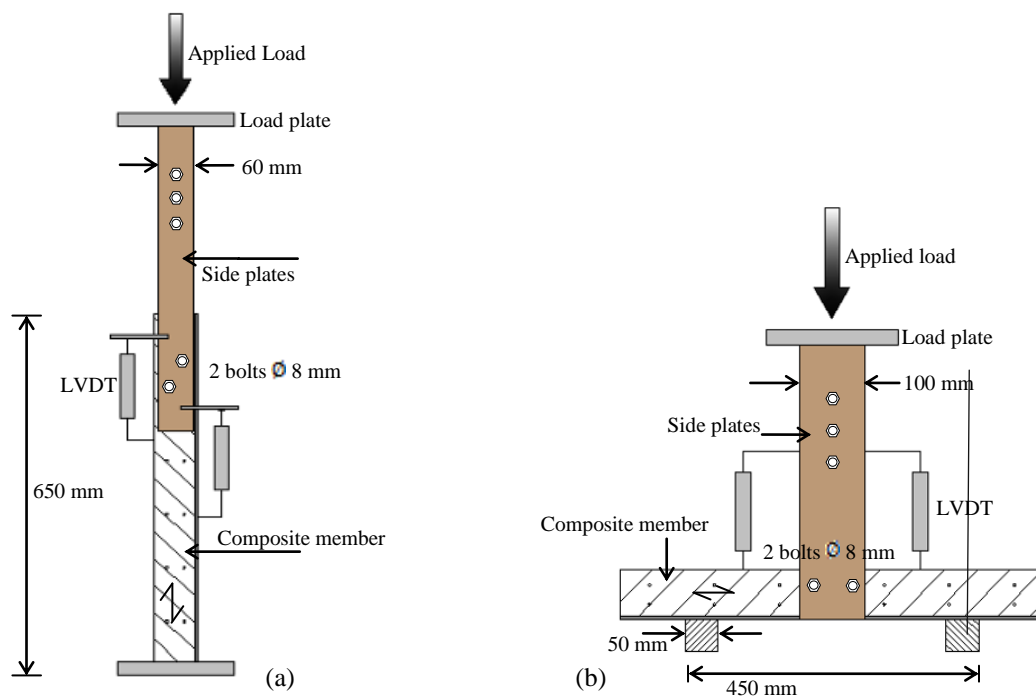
Setup of connection test: (a) parallel loading direction; and (b) perpendicular loading direction
